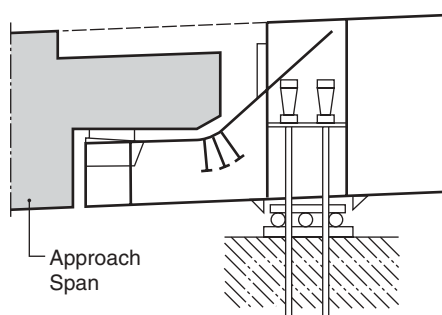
Anchorage of the deck end at the anchor cable attachment through end links inside the abutment
